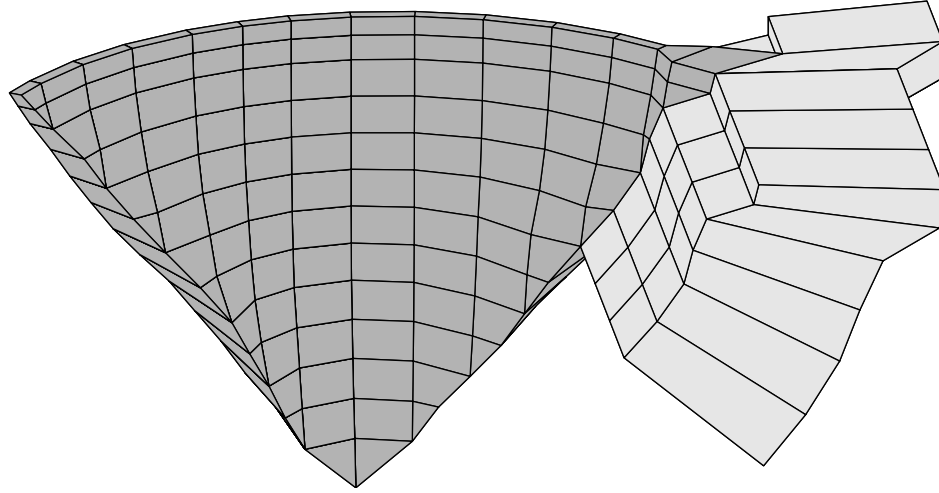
Finite element meshes of Pacoima Dam and the softened region of the foundation at the left abutment (viewed from downstream at an elevated vantage)
